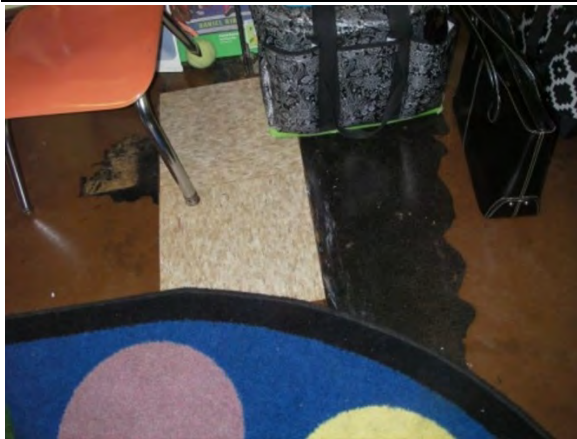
CLASSROOM FLOOR WORN AND PATCHED TILE
